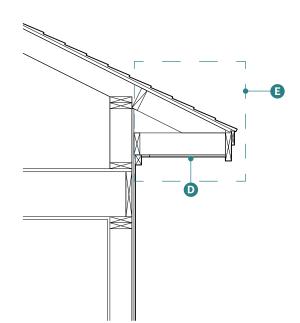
Section Detail of Highest Eave for Pitched Roof
